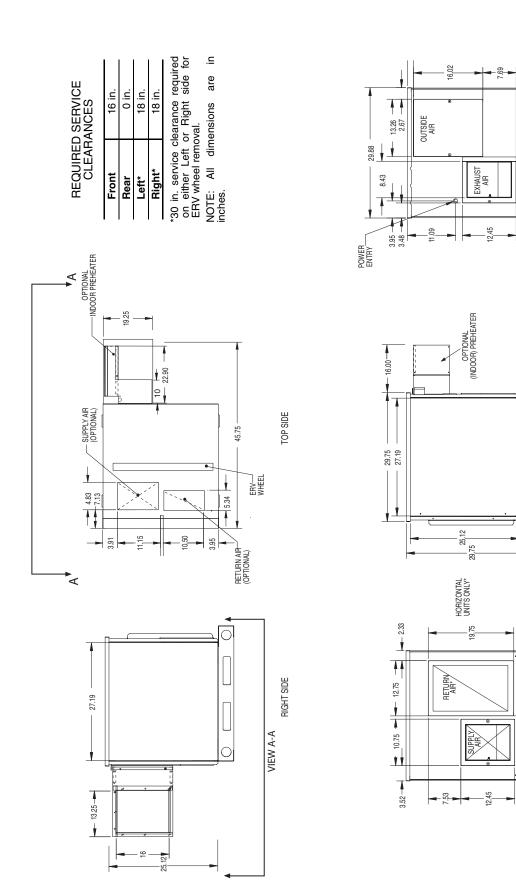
62MB,MC040 Indoor Unit Dimensions
